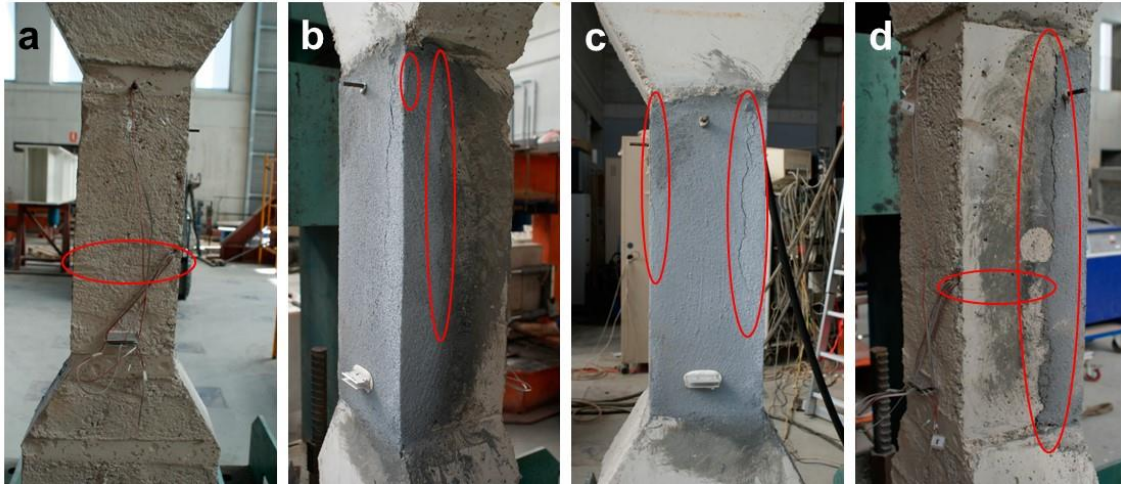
Failure patterns in specimen W4. Sides: a) 1; b) 2; c) 3 and d) 4.
